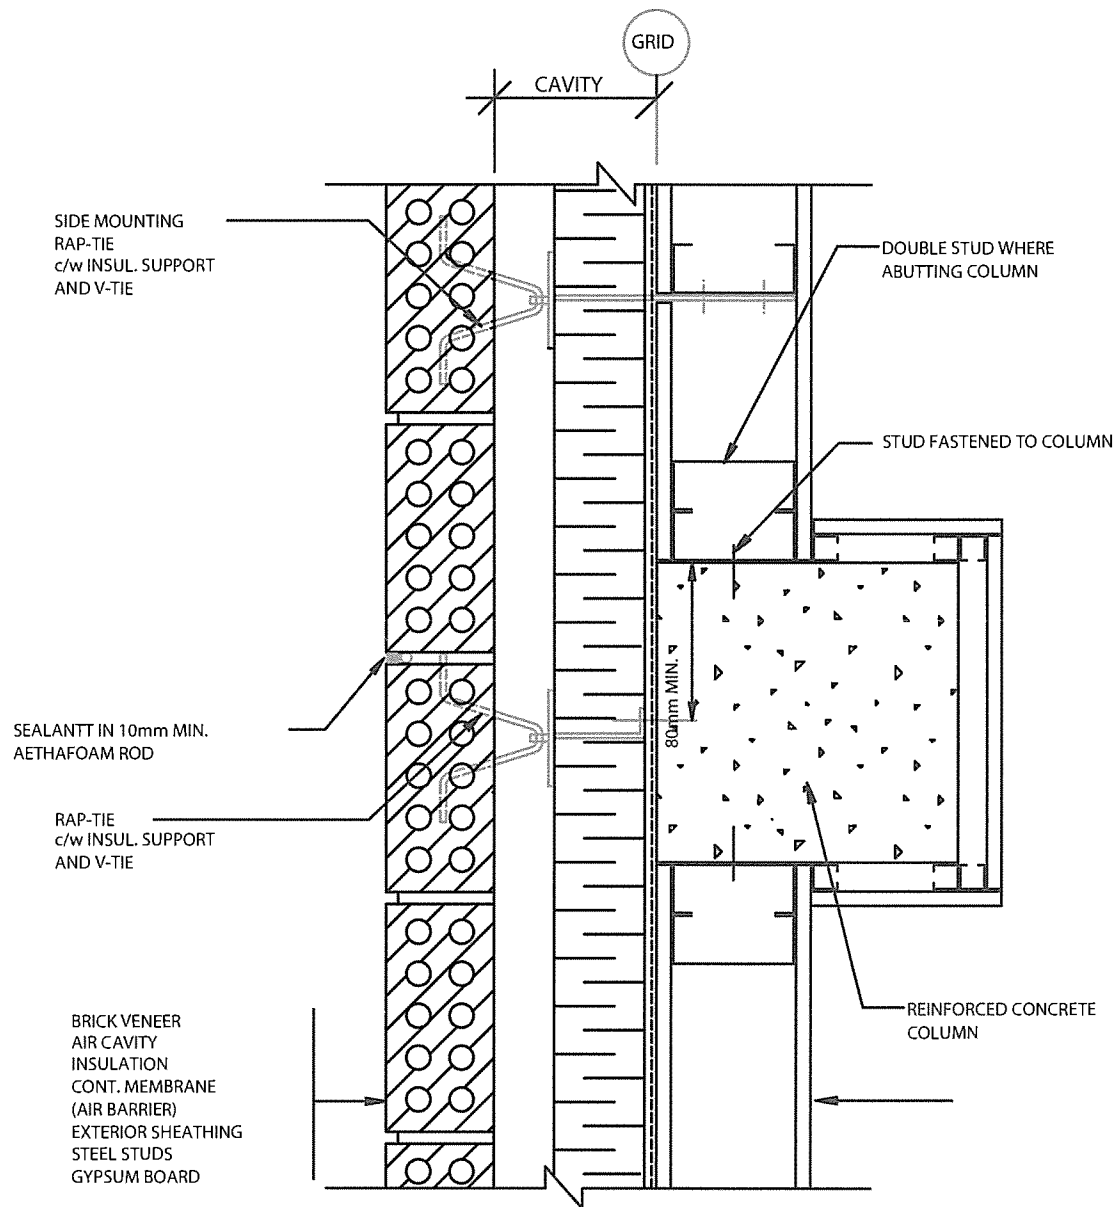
BRICK VENEER / STEEL STUD - CONTROL JOINT/AIR STOP
